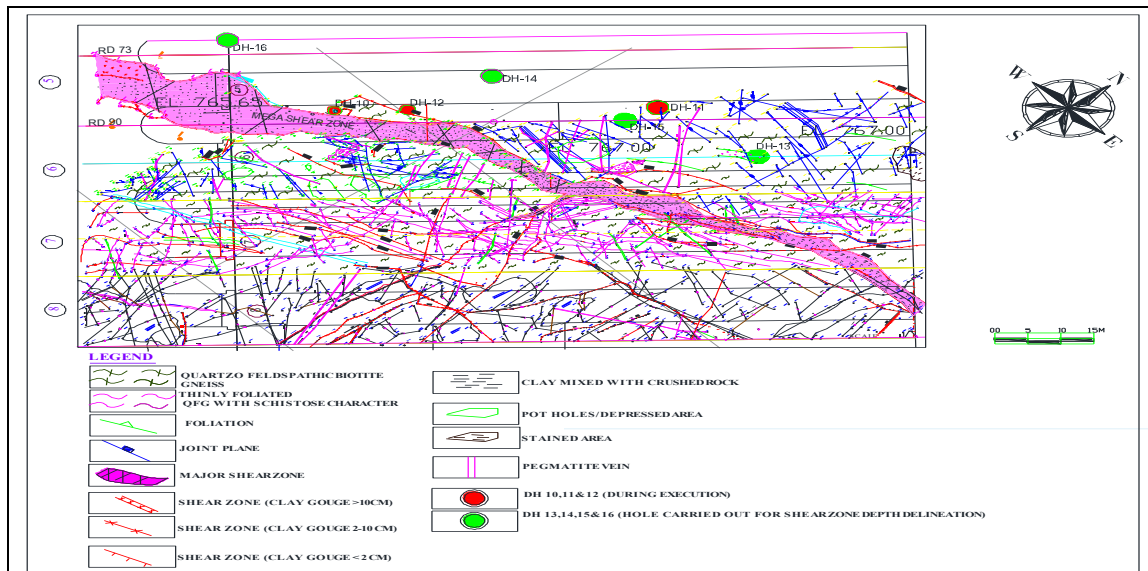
Geological plan of shear zone (EL 765.0m) and adjacent blocks.
